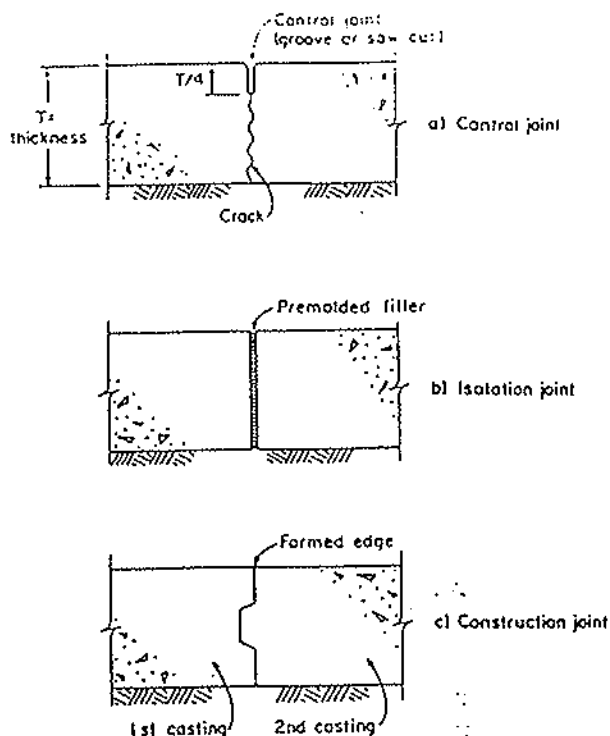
The three basic types of joints used in concrete slab-on-ground construction.
